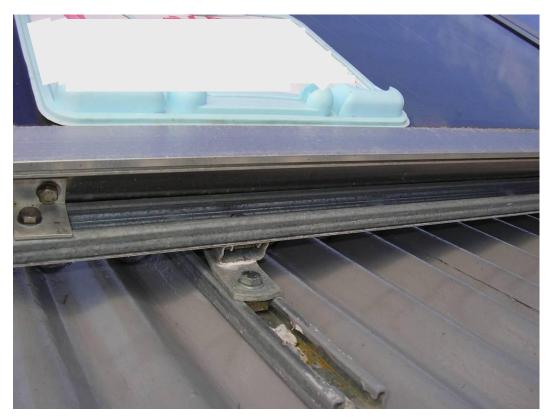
Galvanised brackets and stainless steel screws – channel not separated from roof.
